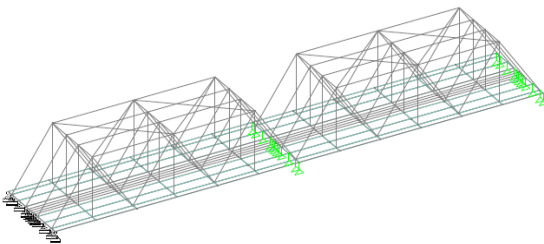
3D view of proposed bridge (Phyoe and Htat 2014)
